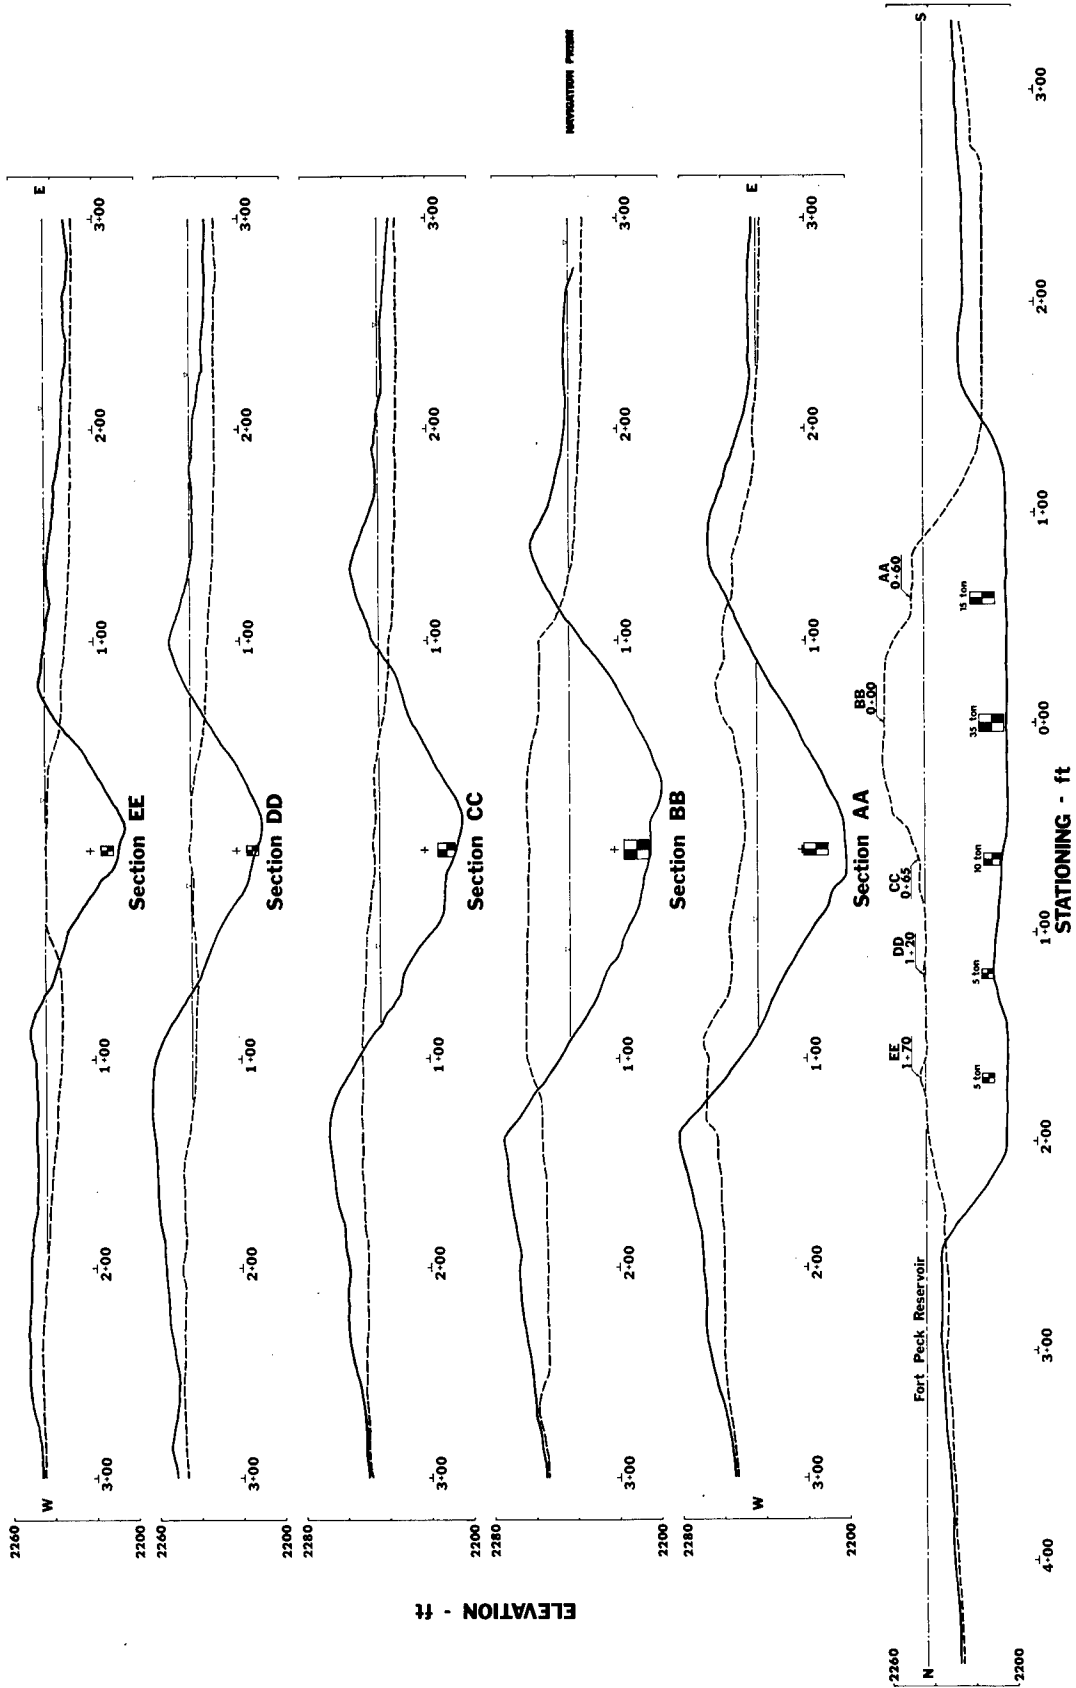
Centerline profile and cross sections, Reservoir connection experiment.
